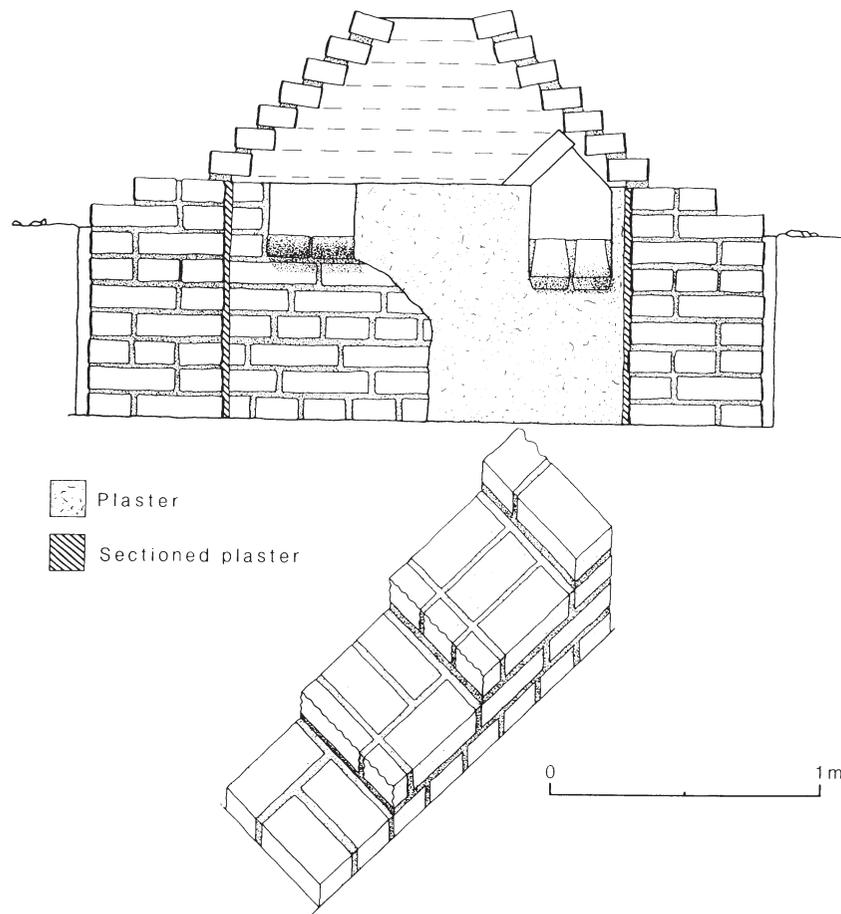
Reconstruction drawing of Kiln 3 as built for the experimental firing, and showing the complicated brickwork pattern used in its construction. (Drawing by Ian Dennis).
